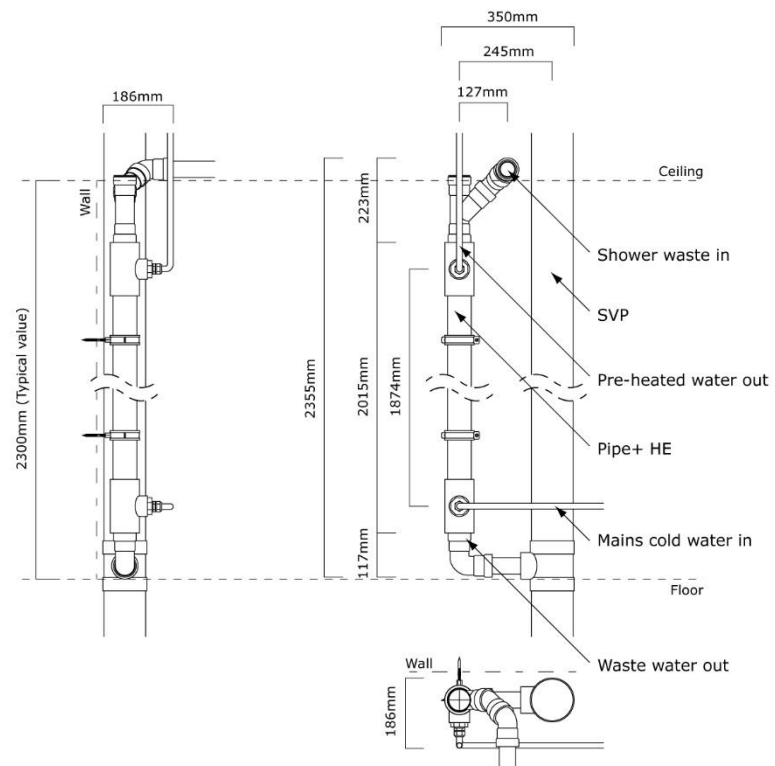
b. Dimensions & Connections with horizontal shower waste
